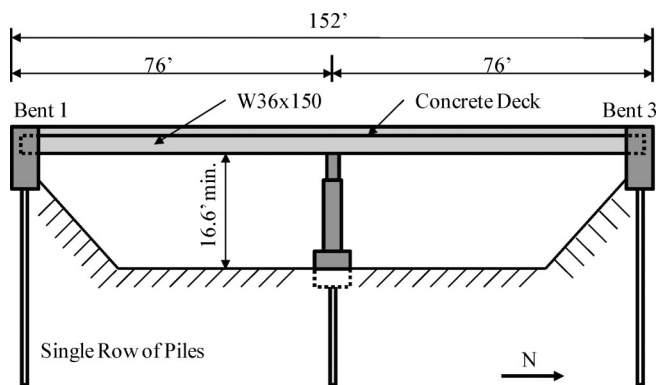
Elevation View of Southbound I-65 over SR-25
